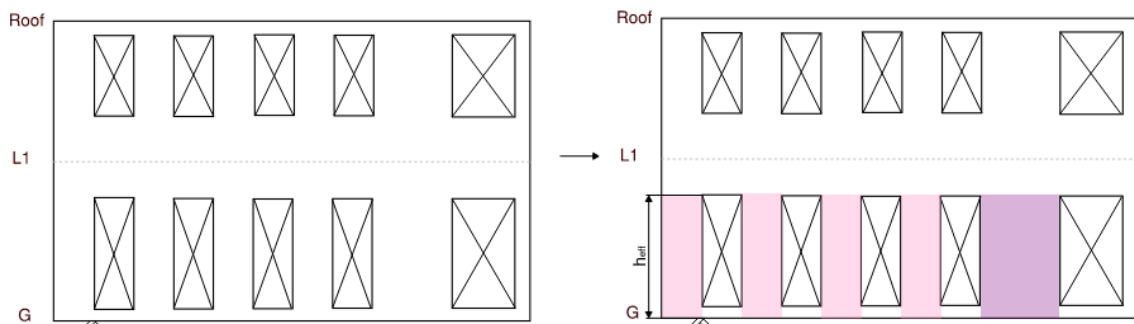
Example URM punched wall, and ground floor pier idealisation
